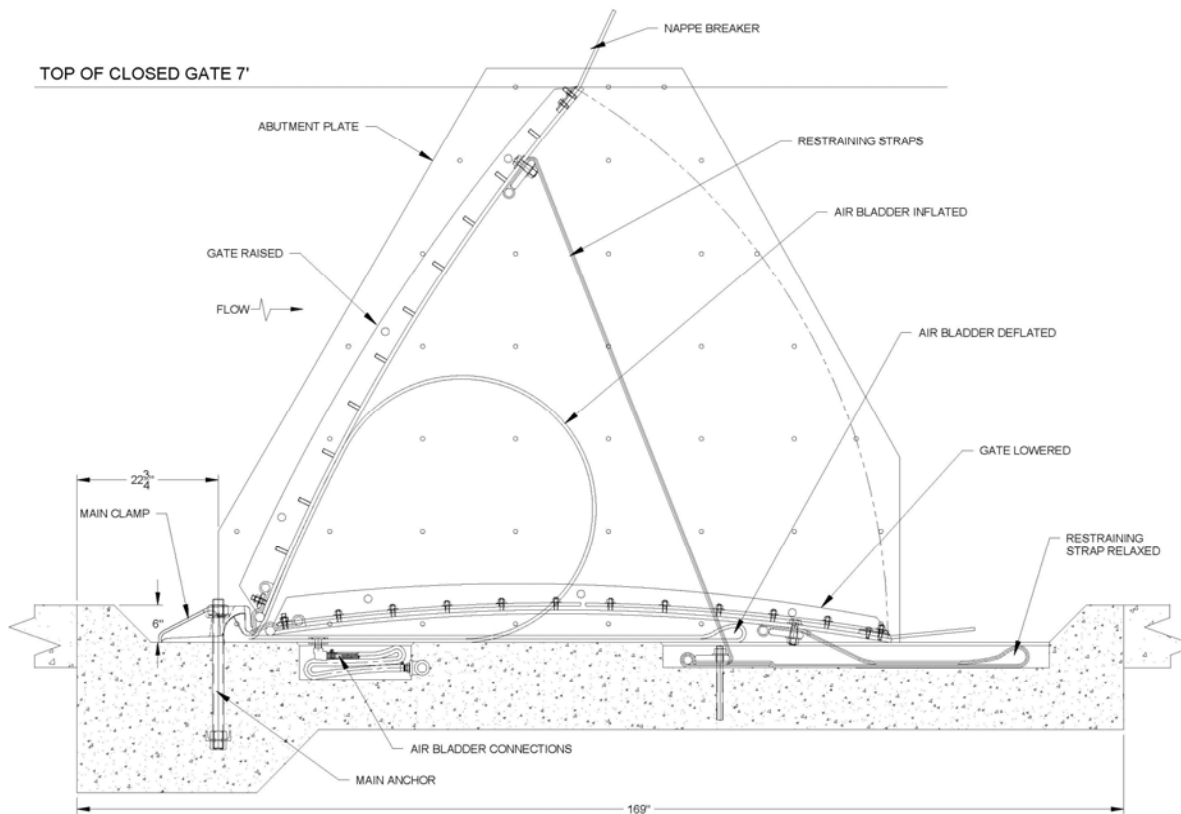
Rubber Dam with Gate, Schematic Drawing
